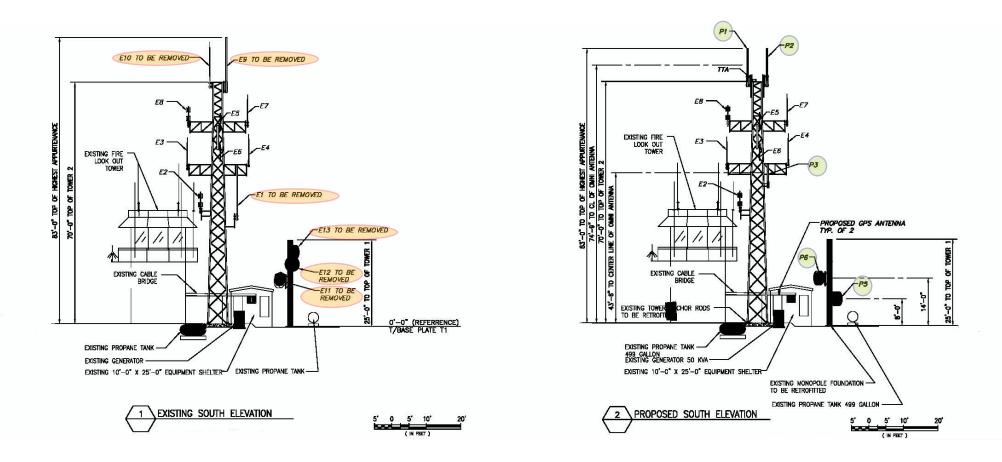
Site 5 - Mt. Barnabe Existing and Proposed Elevations
